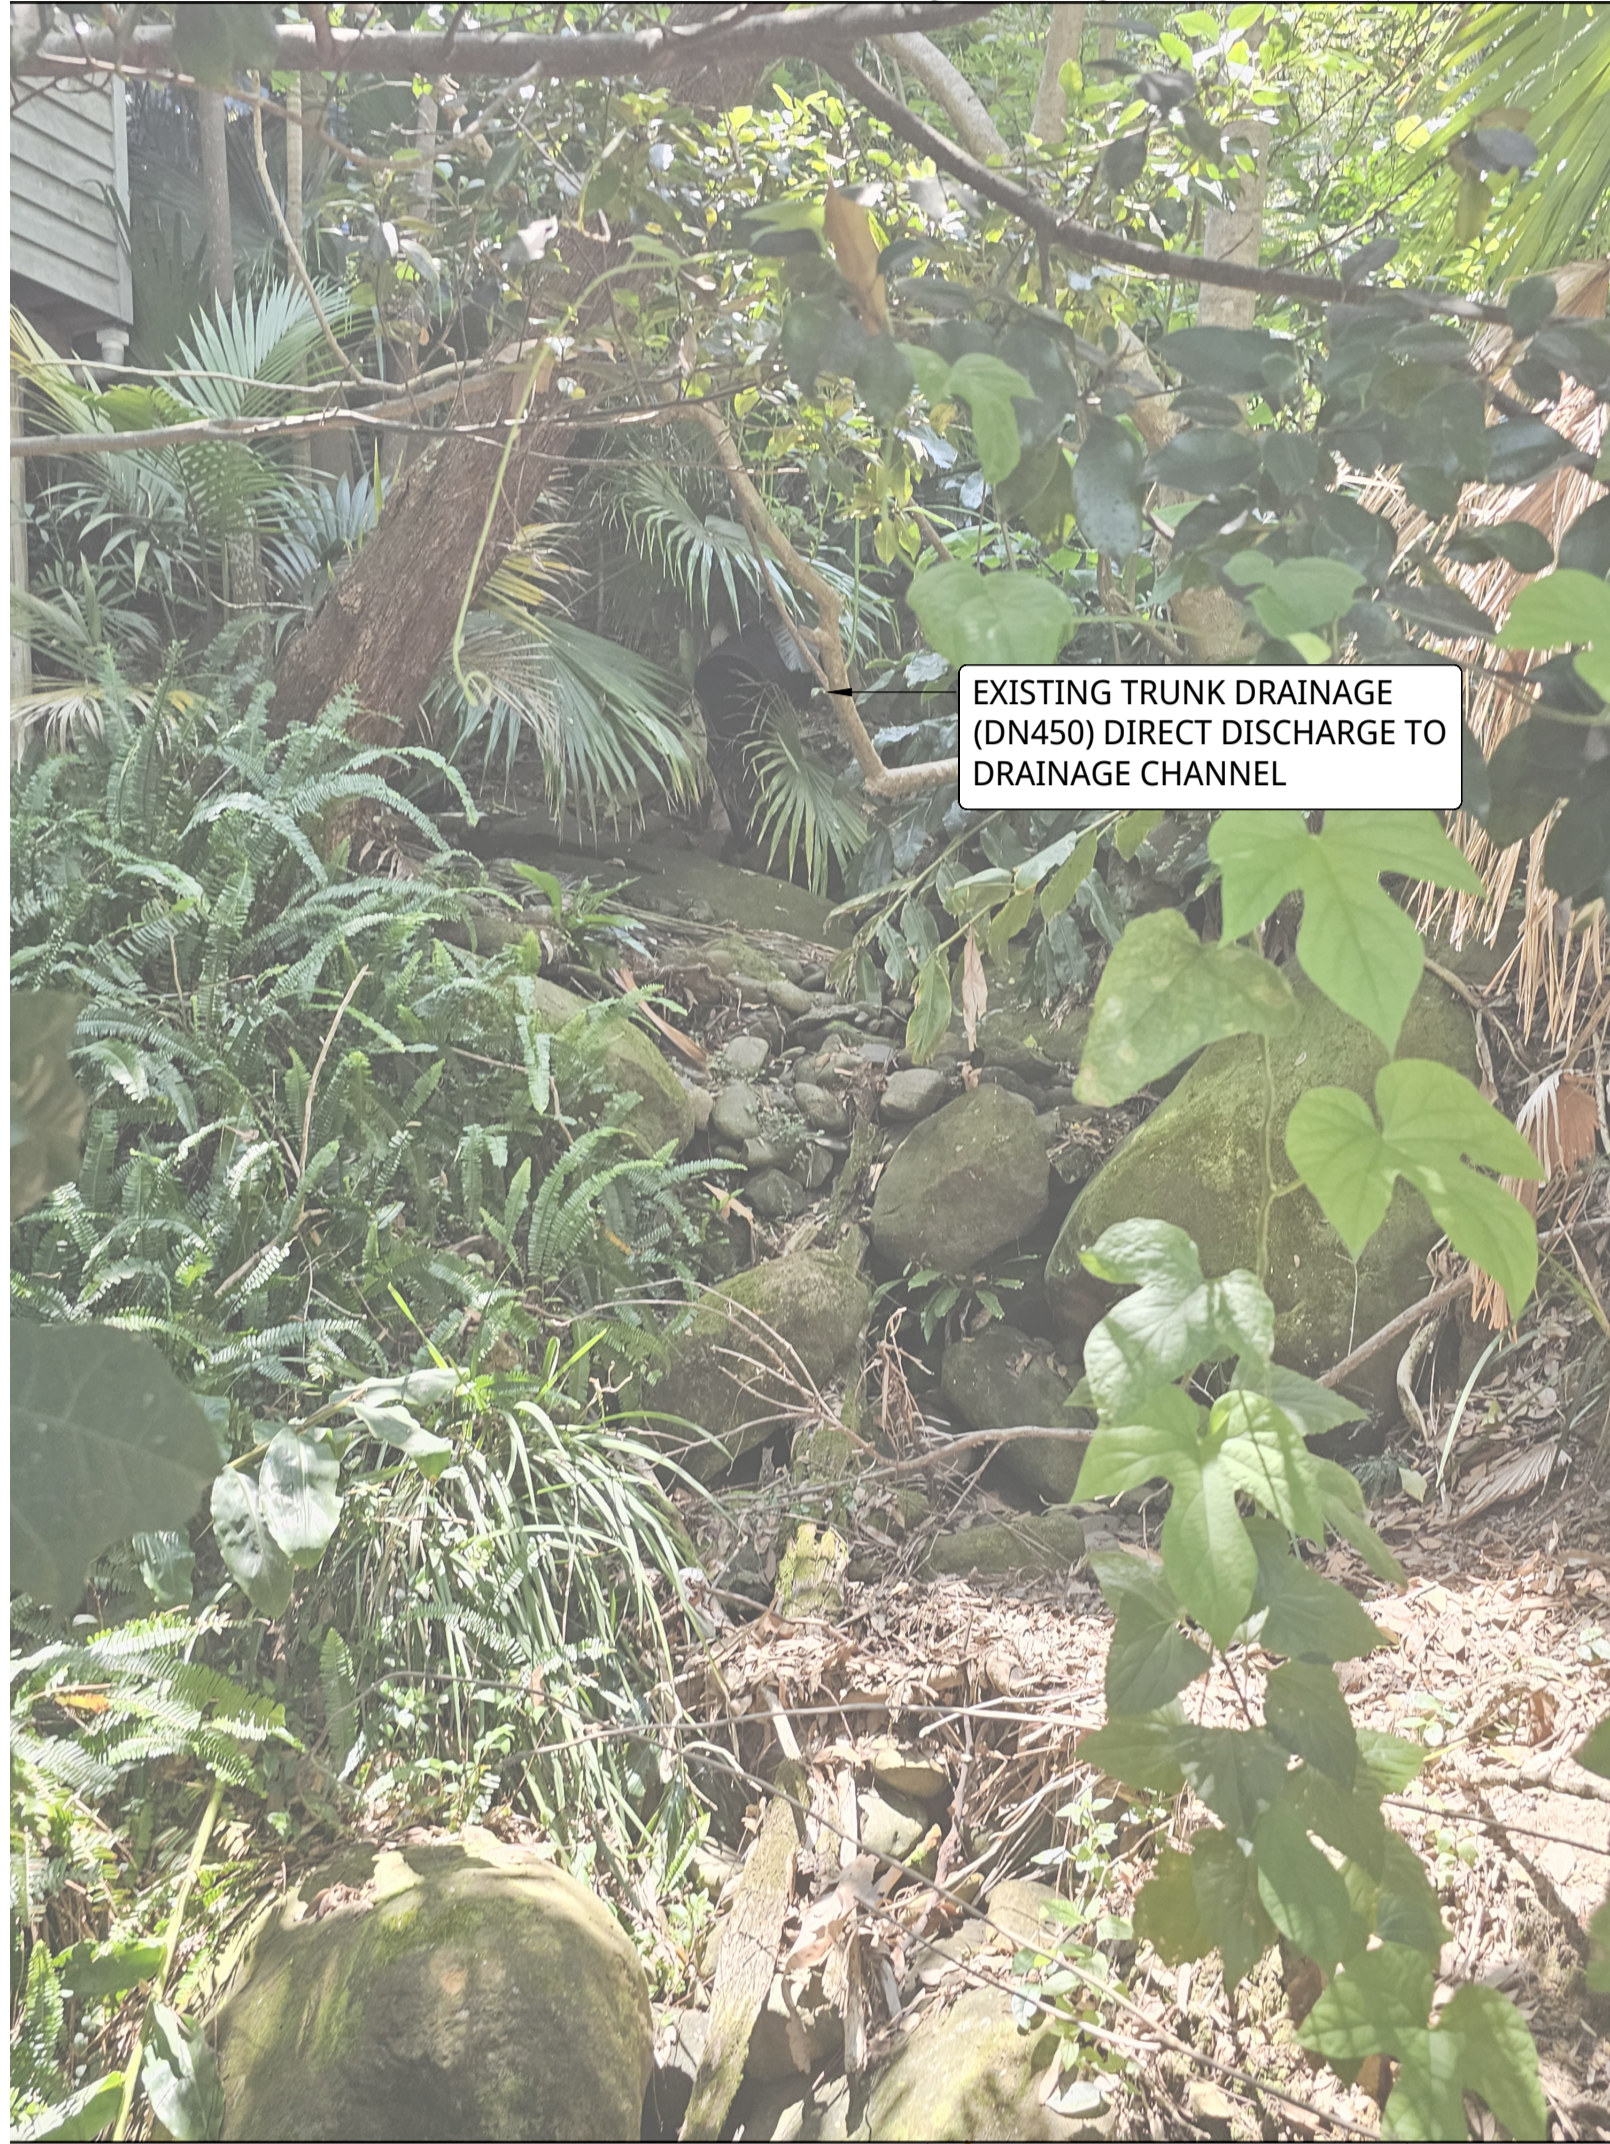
EXISTING TRUNK DRAINAGE AND DRAINAGE CHANNEL
